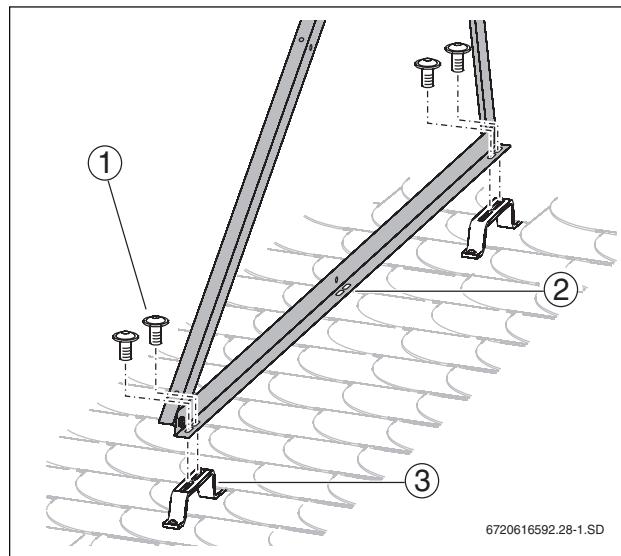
Roof connection with roof jacks (here: on roof with asphalt/slate/composite shingles)
